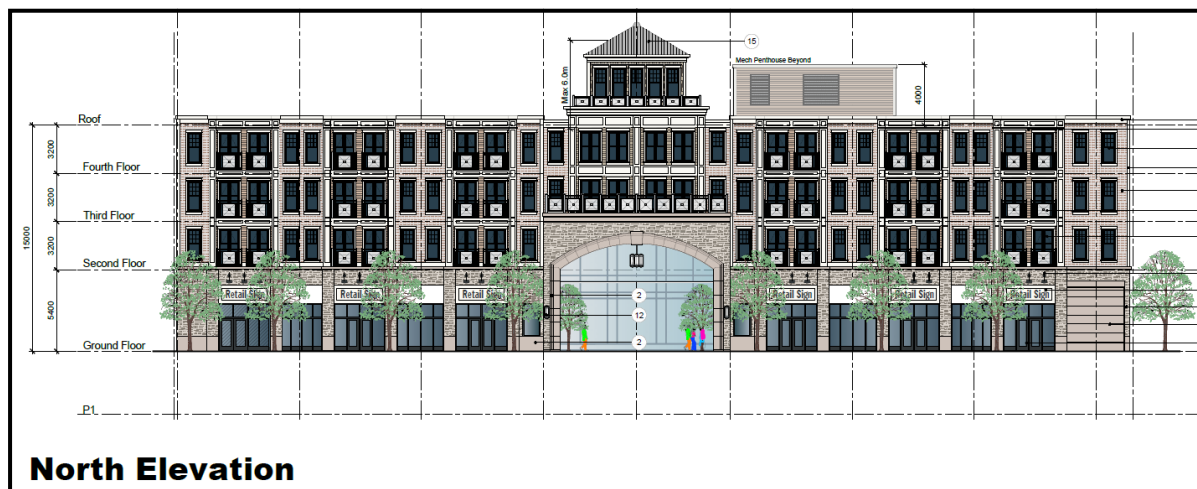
Elevation of Proposed Retirement Home with Ground Floor Commercial
